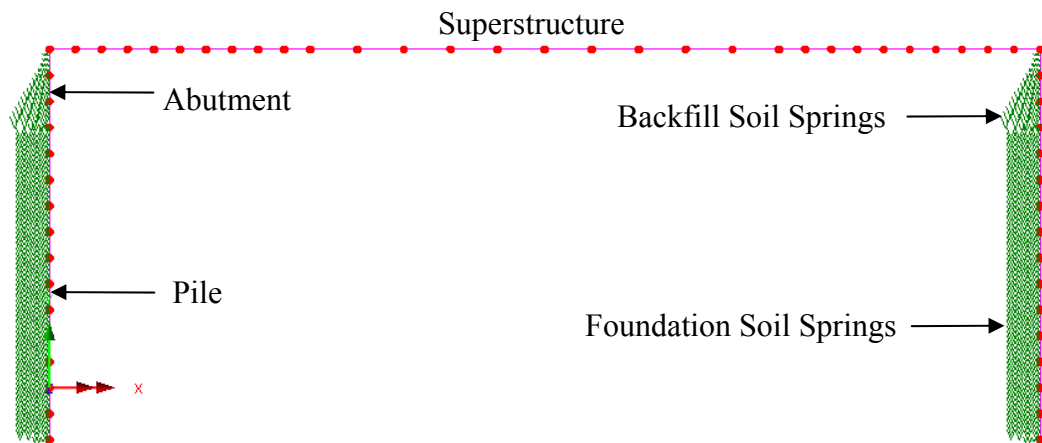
A Typical 2D FE Model for the Single-Span Bridge
